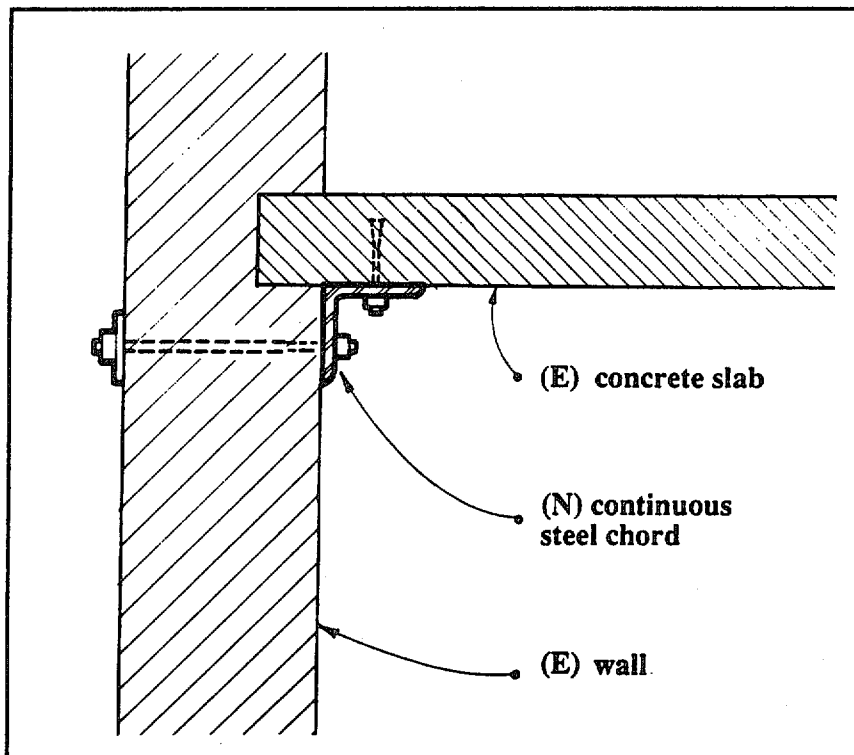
Adding a new steel member to an existing precast concrete diaphragm.
